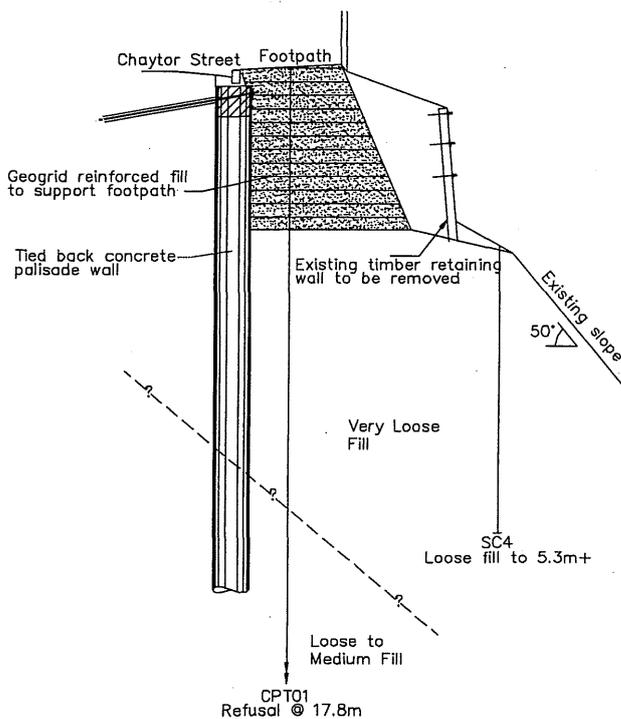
Section 2 Palisade wall and Geogrid reinforcement.
